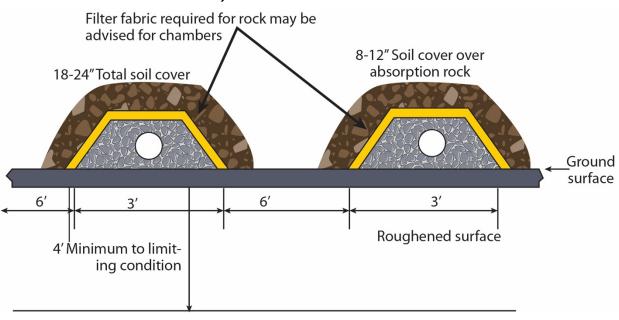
Typical At-Grade Lateral Section (rock and pipe shown; chambers would be similar)
